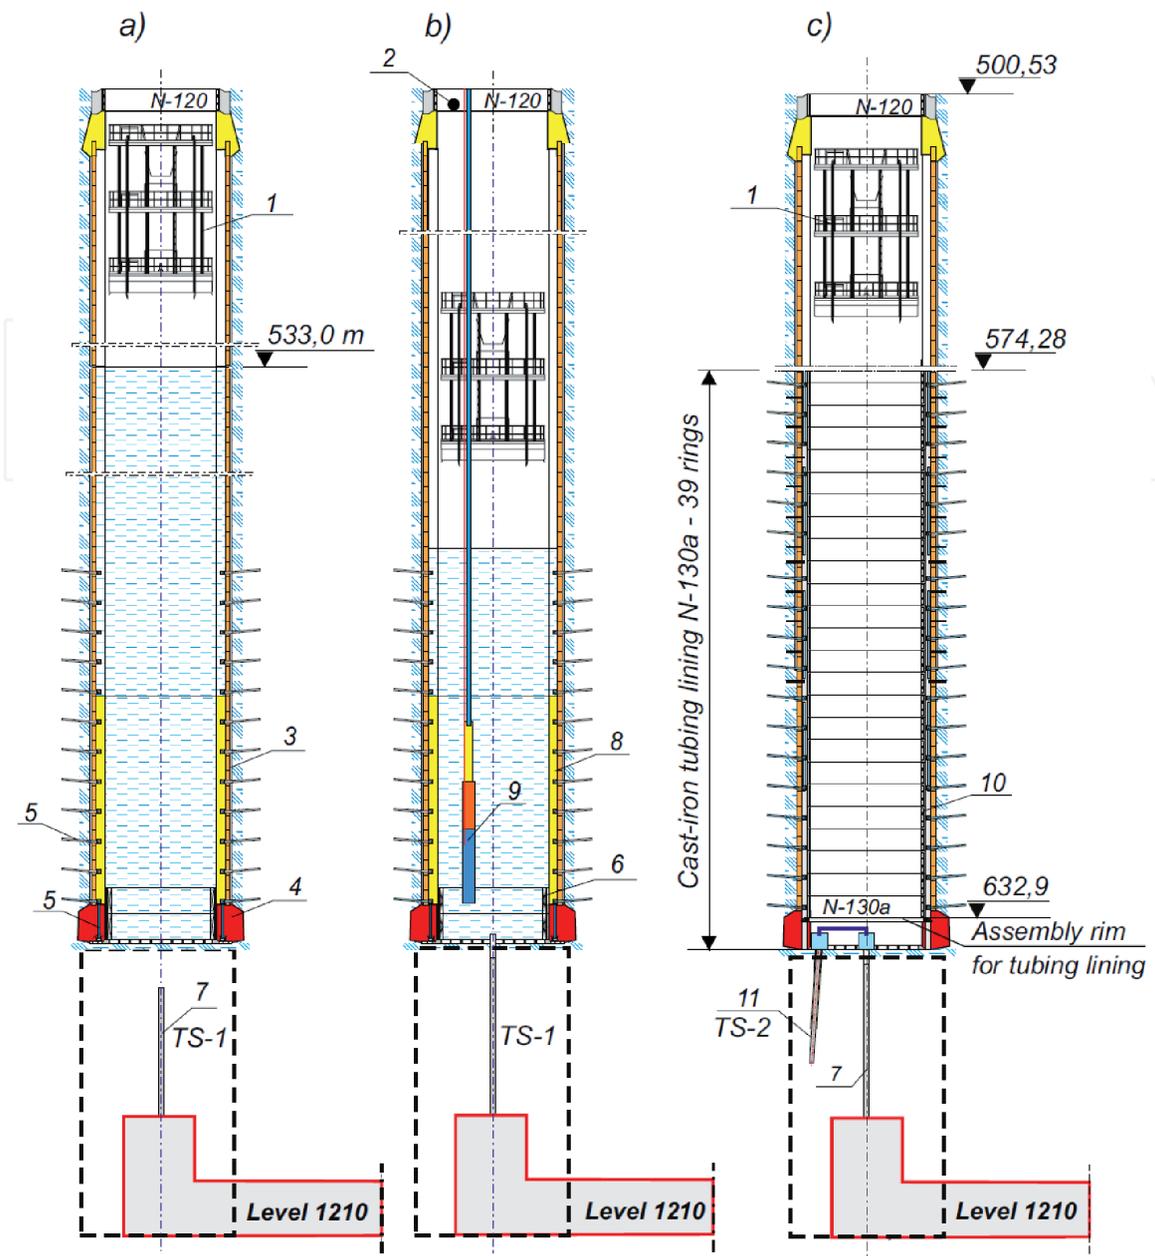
The phases of dewatering the sunken shaft section. (a) Shaft flooding. (b) Dewatering of the shaft using a “RITZ” submersible pump, (c) replacing the concrete lining along the 574.3–632.9 m section with a cast-iron tubing lining. Explanations: 1–8, see Figure 1; 9, RITZ submersible pump; 10, cast-iron tubing lining; 11, TS-2 dewatering borehole.
